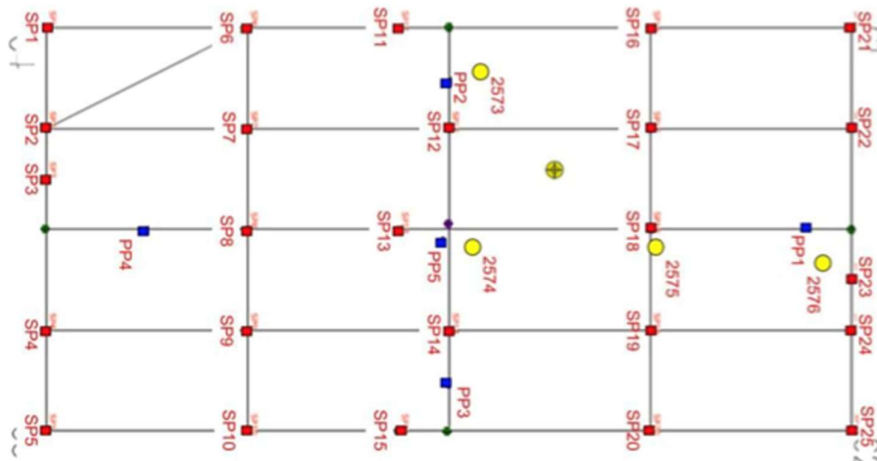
Settlement plates (SP) layout arrangement at trial site
